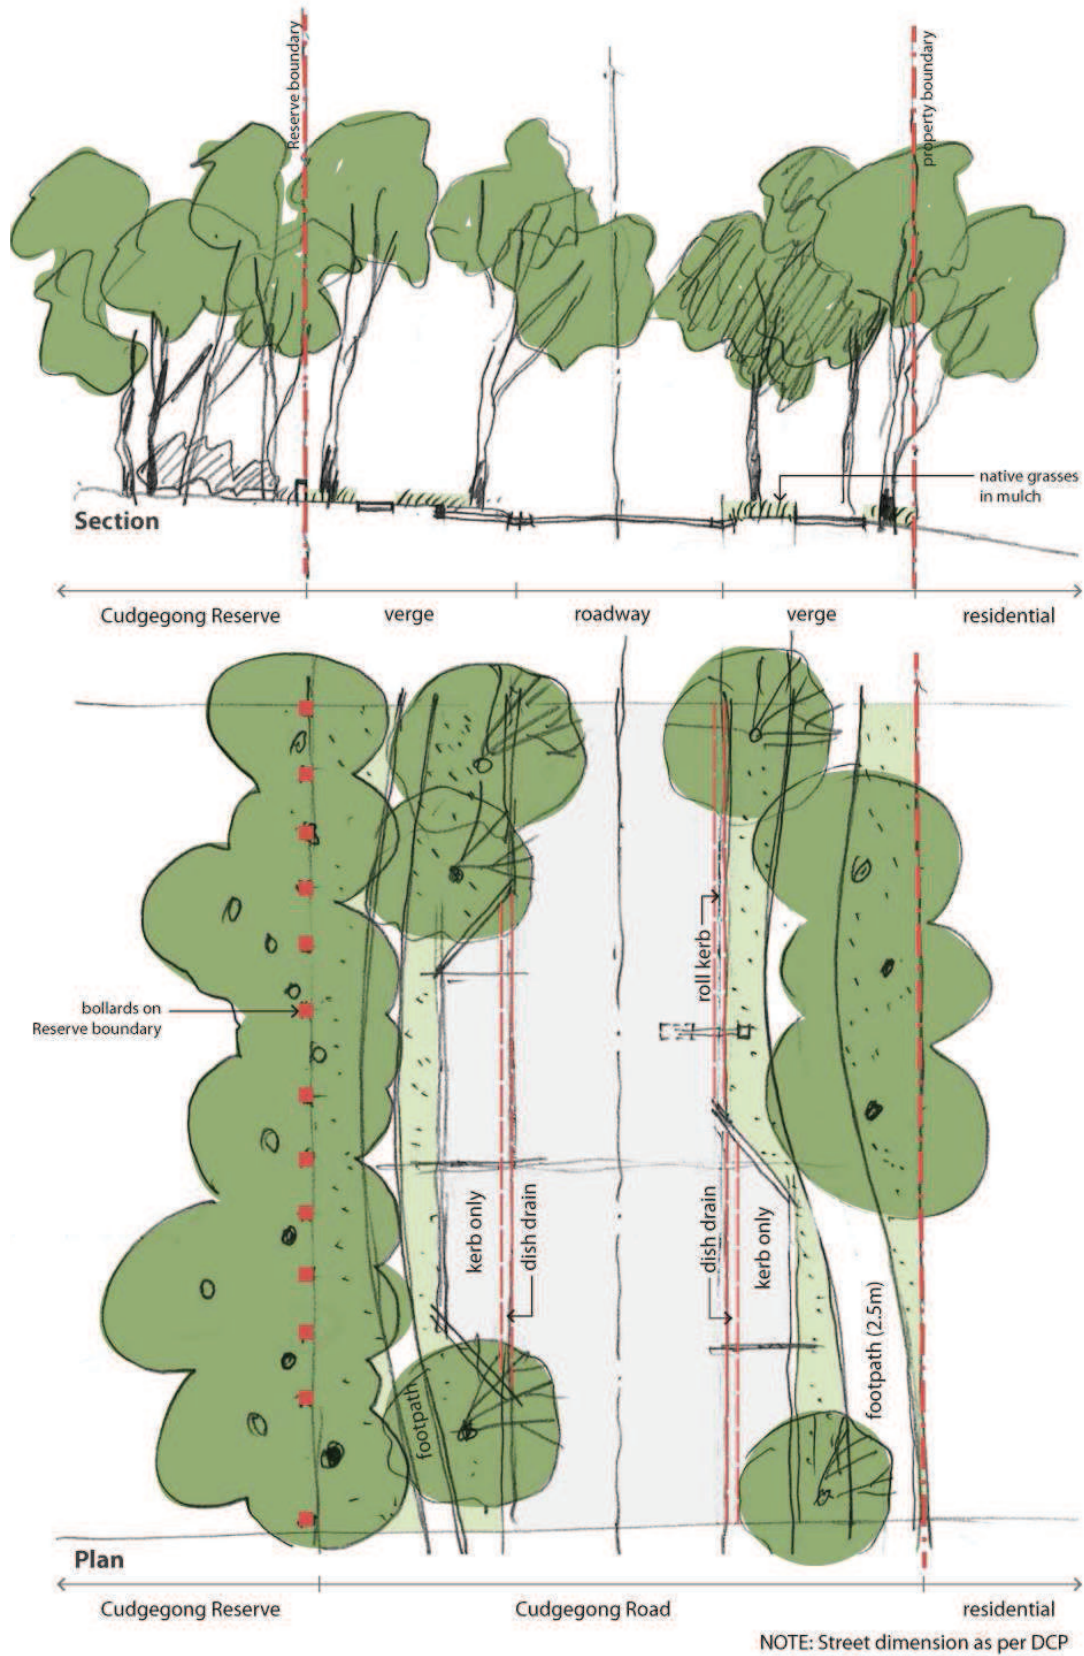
Cudgegong Reserve / Road Concept Plan and Section B
